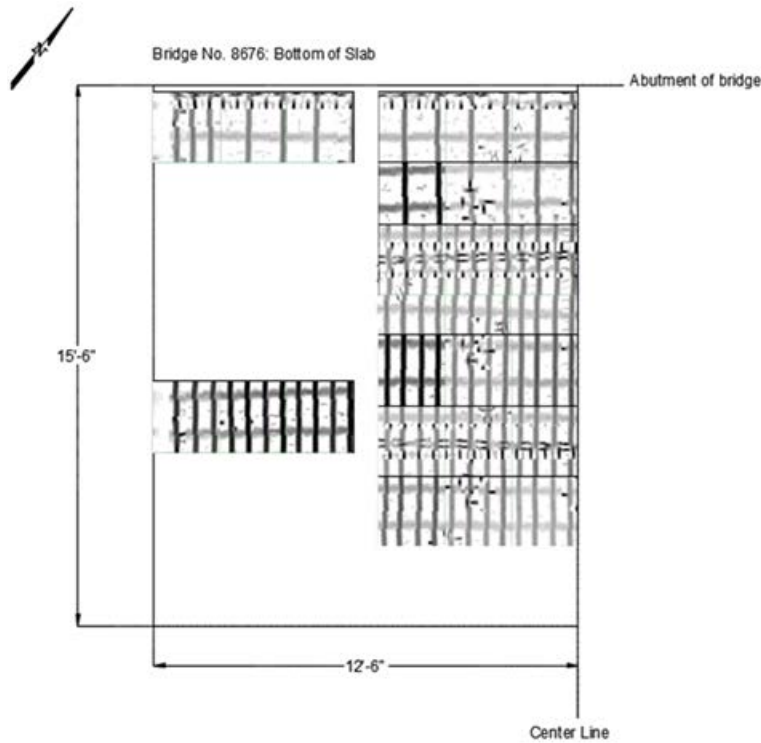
Typical blockscan results for reinforced concrete slab bridge.
